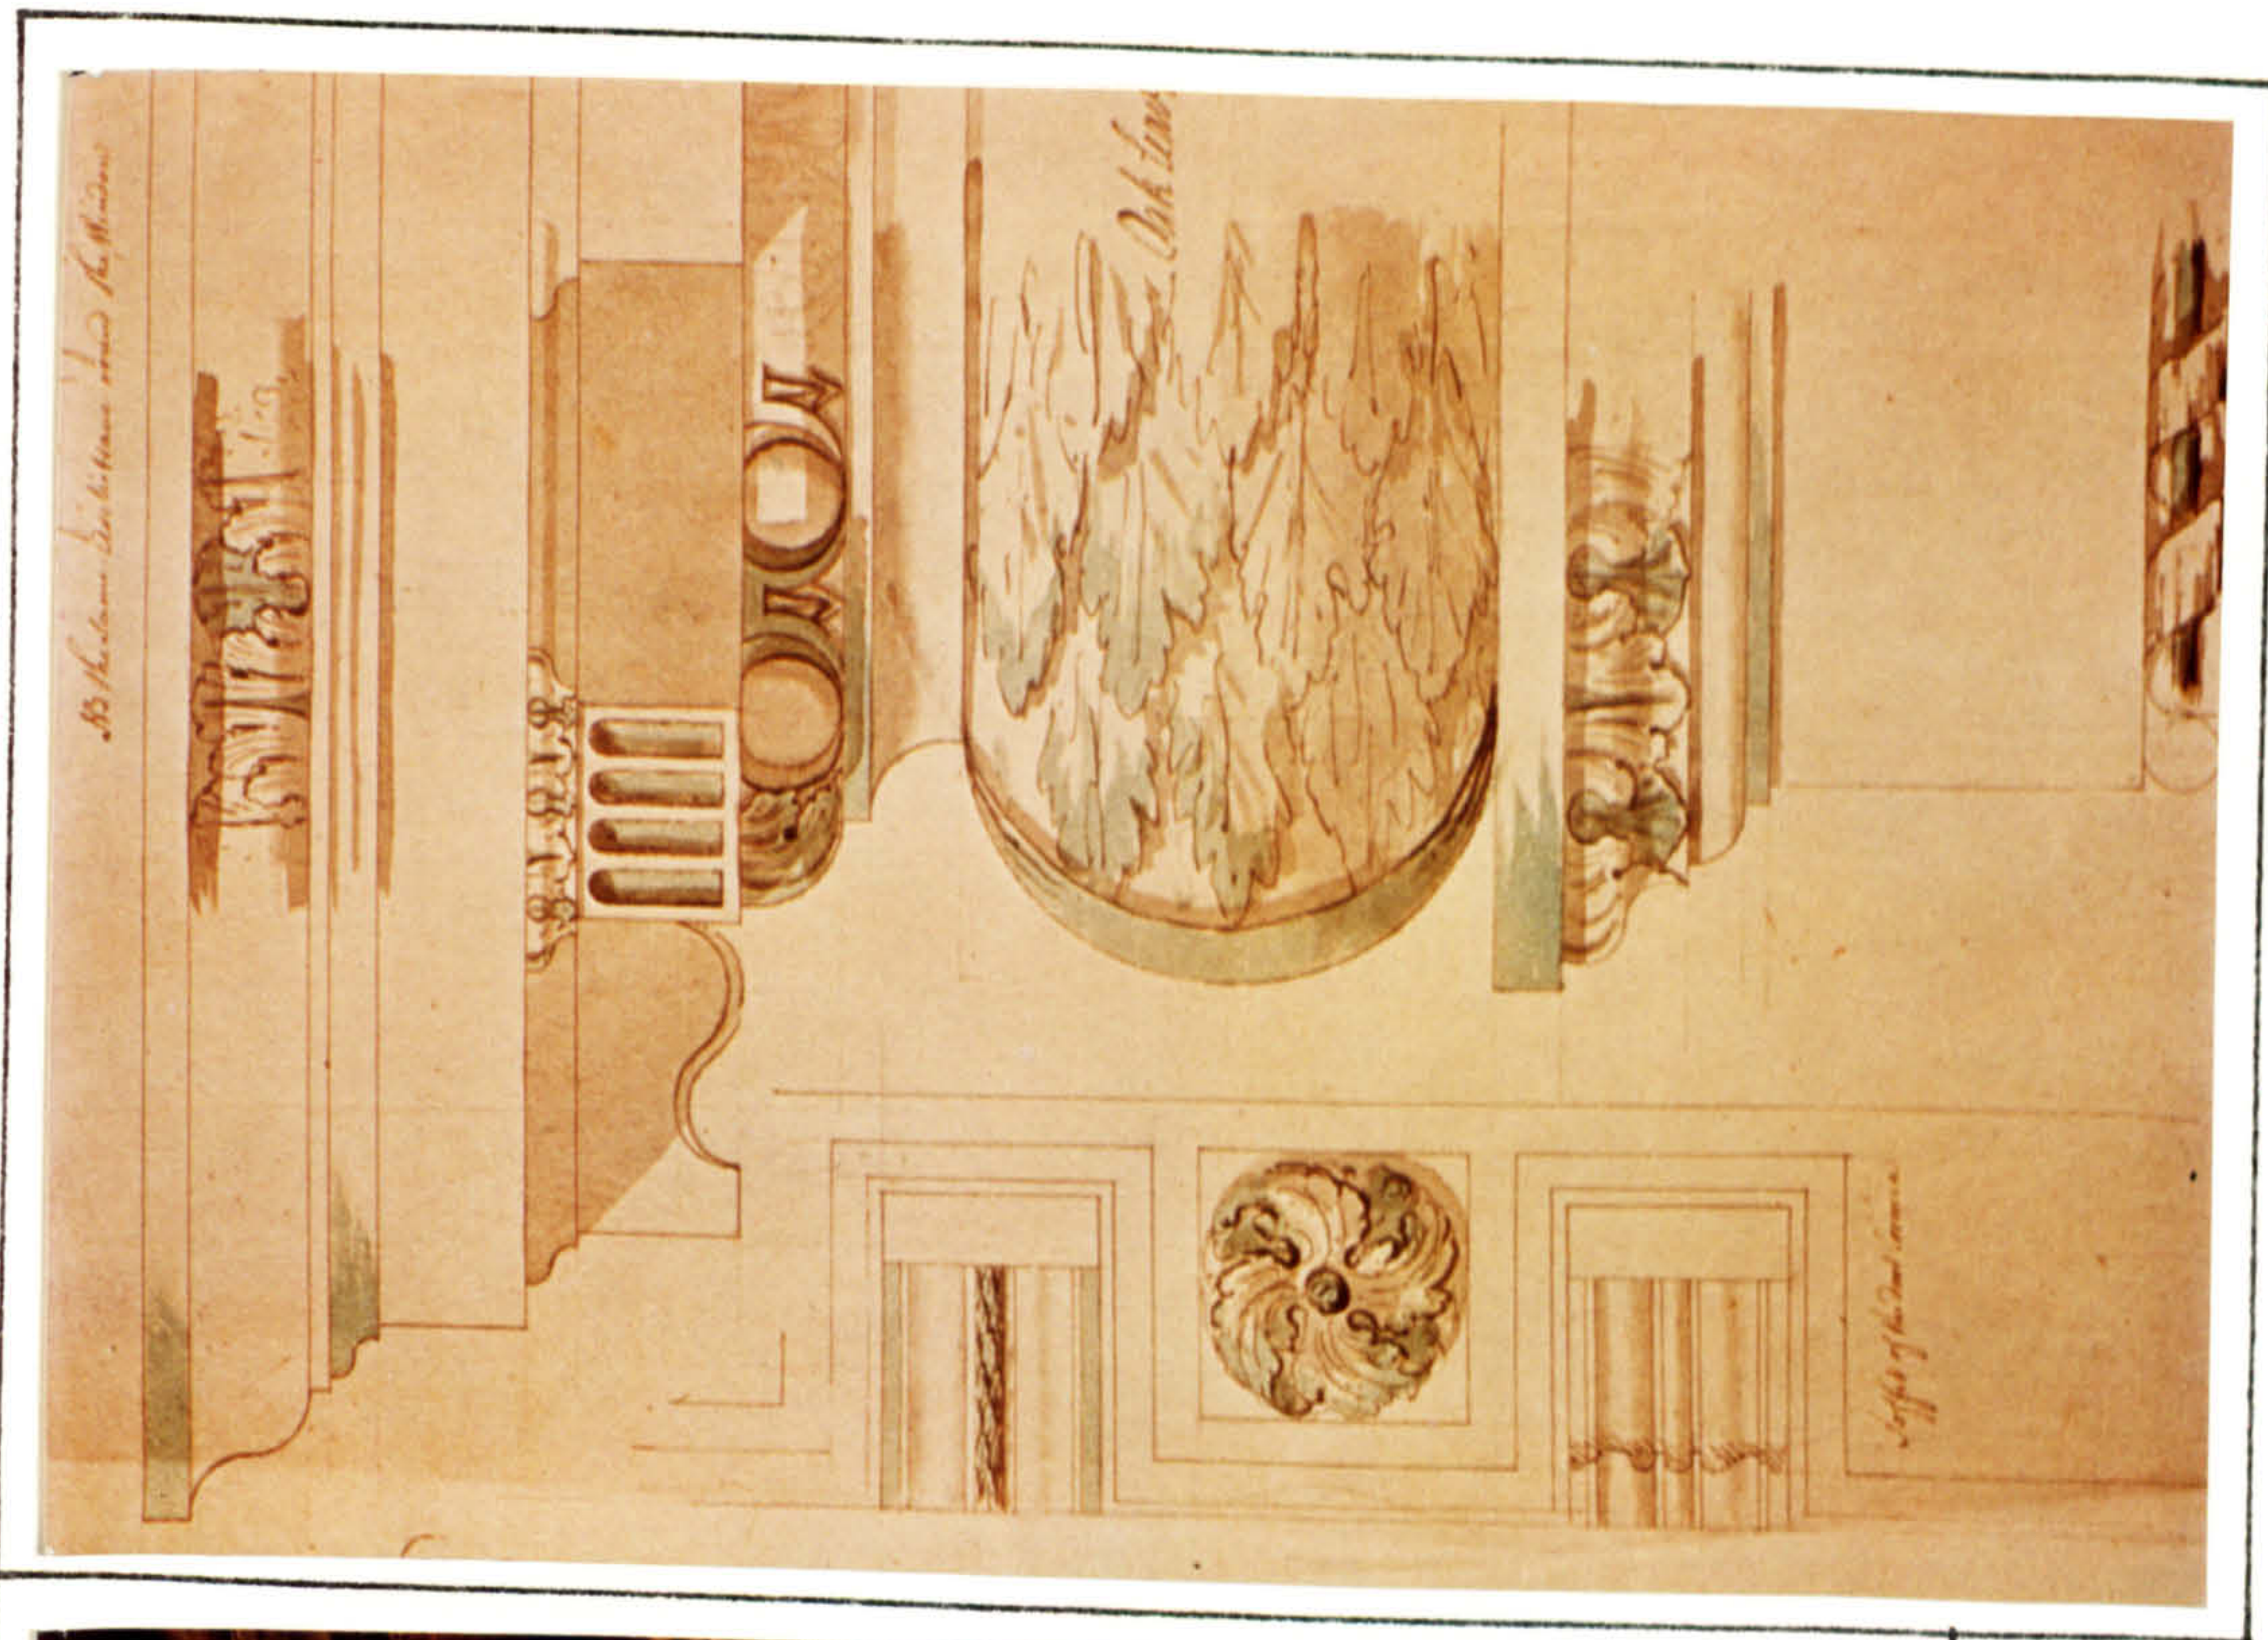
WILLIAM CHAMBERS. DRAWING SHOWING A SCHEME OF BLUE PICKING OUT ON A DOORCASE
